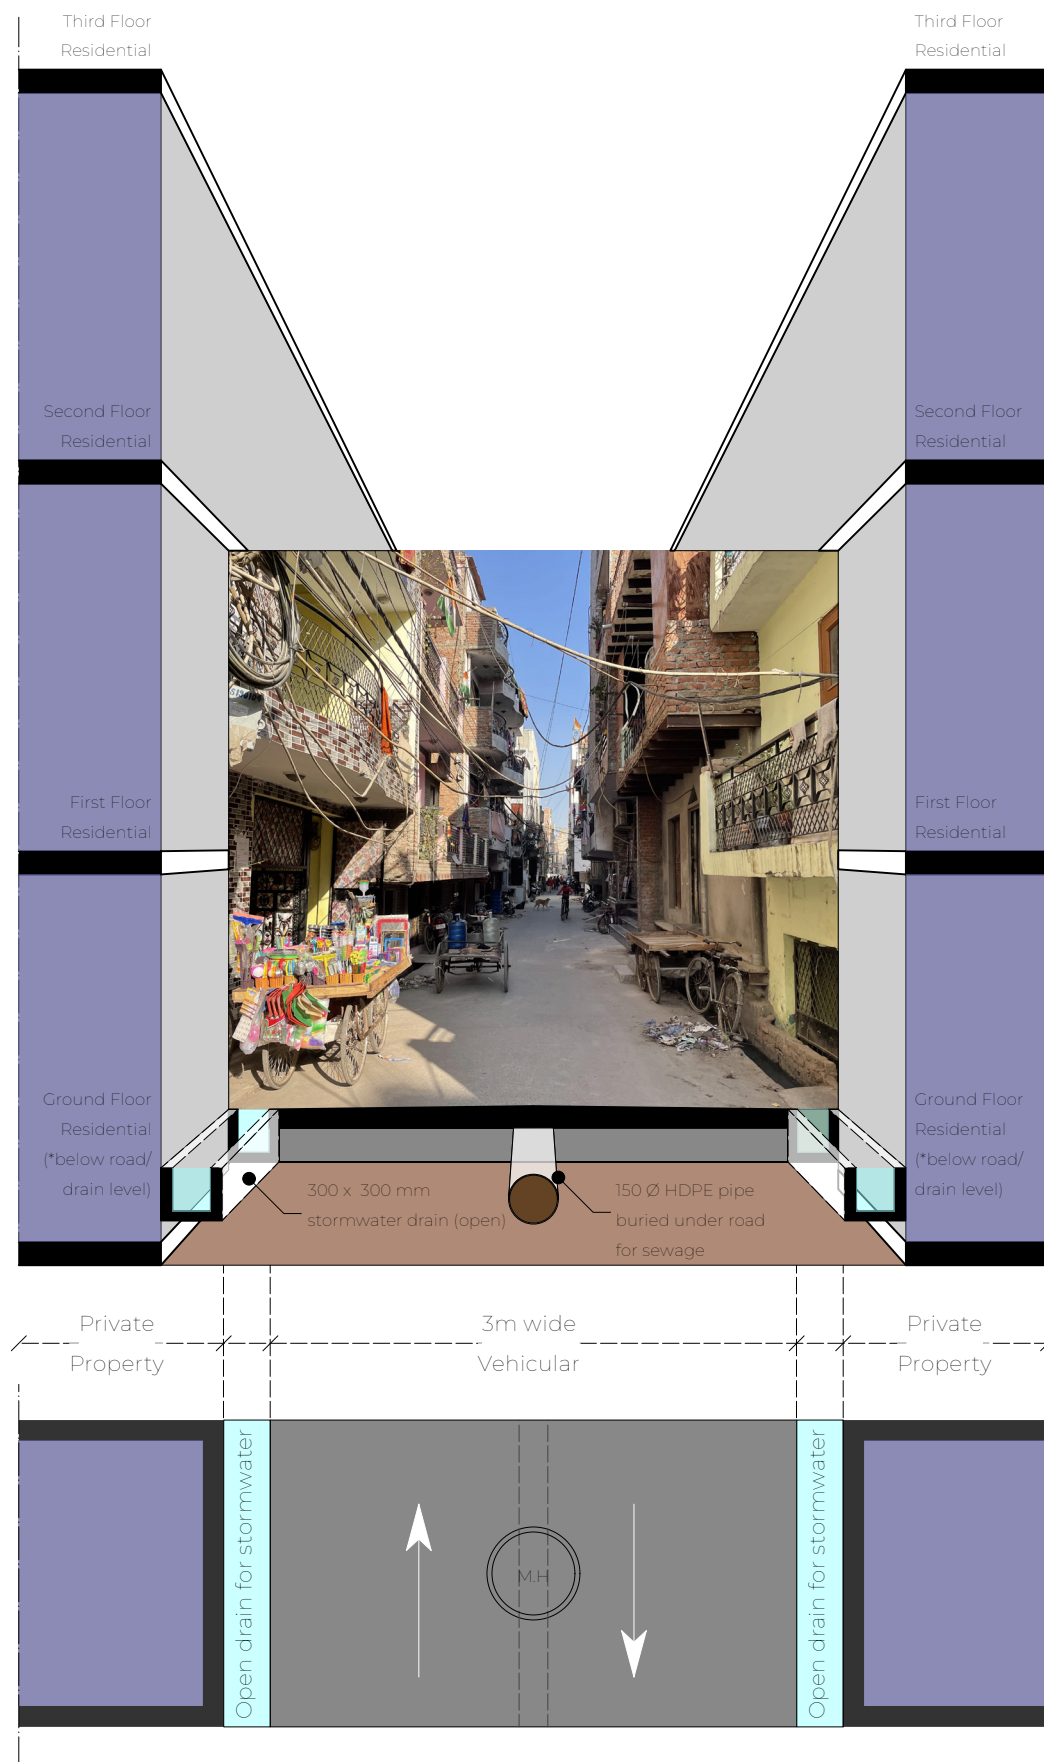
Sangam Vihar - Cross sectional view of secondary street
